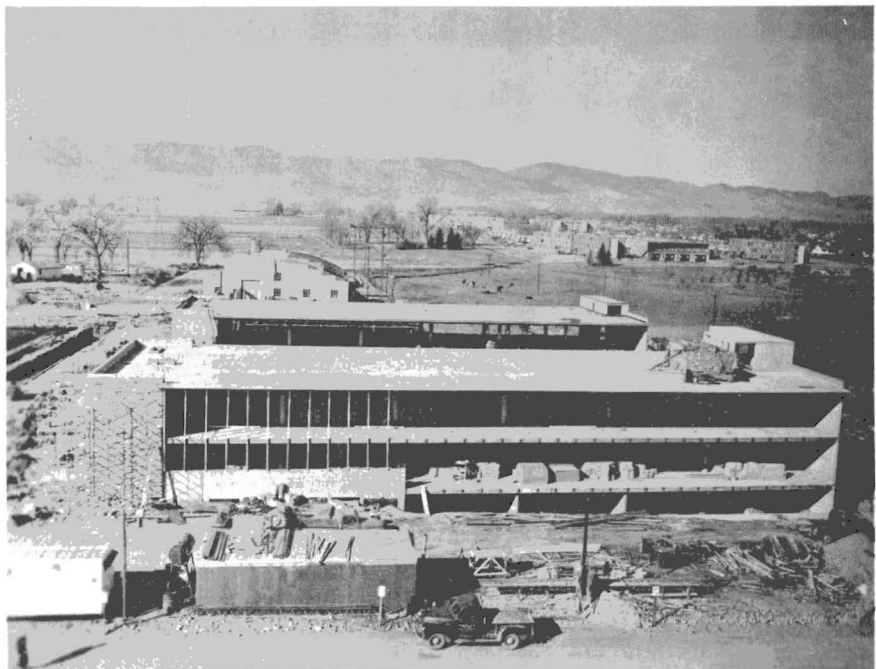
New construction -- Engineering Center in foreground, Hydraulics Laboratory also shown.
